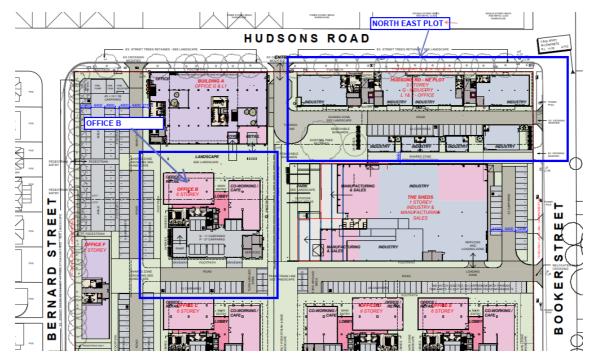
Plan of proposal, Source: Architectural Plan (TP004 Rev A) by Six Degrees Pty Ltd
